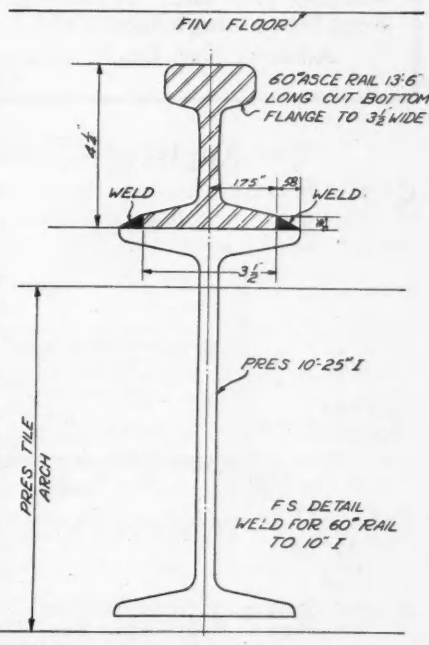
Details Showing 60-Pound Rail Welded to Old Beam to Give the Beam Greater Load Bearing Capacity.
